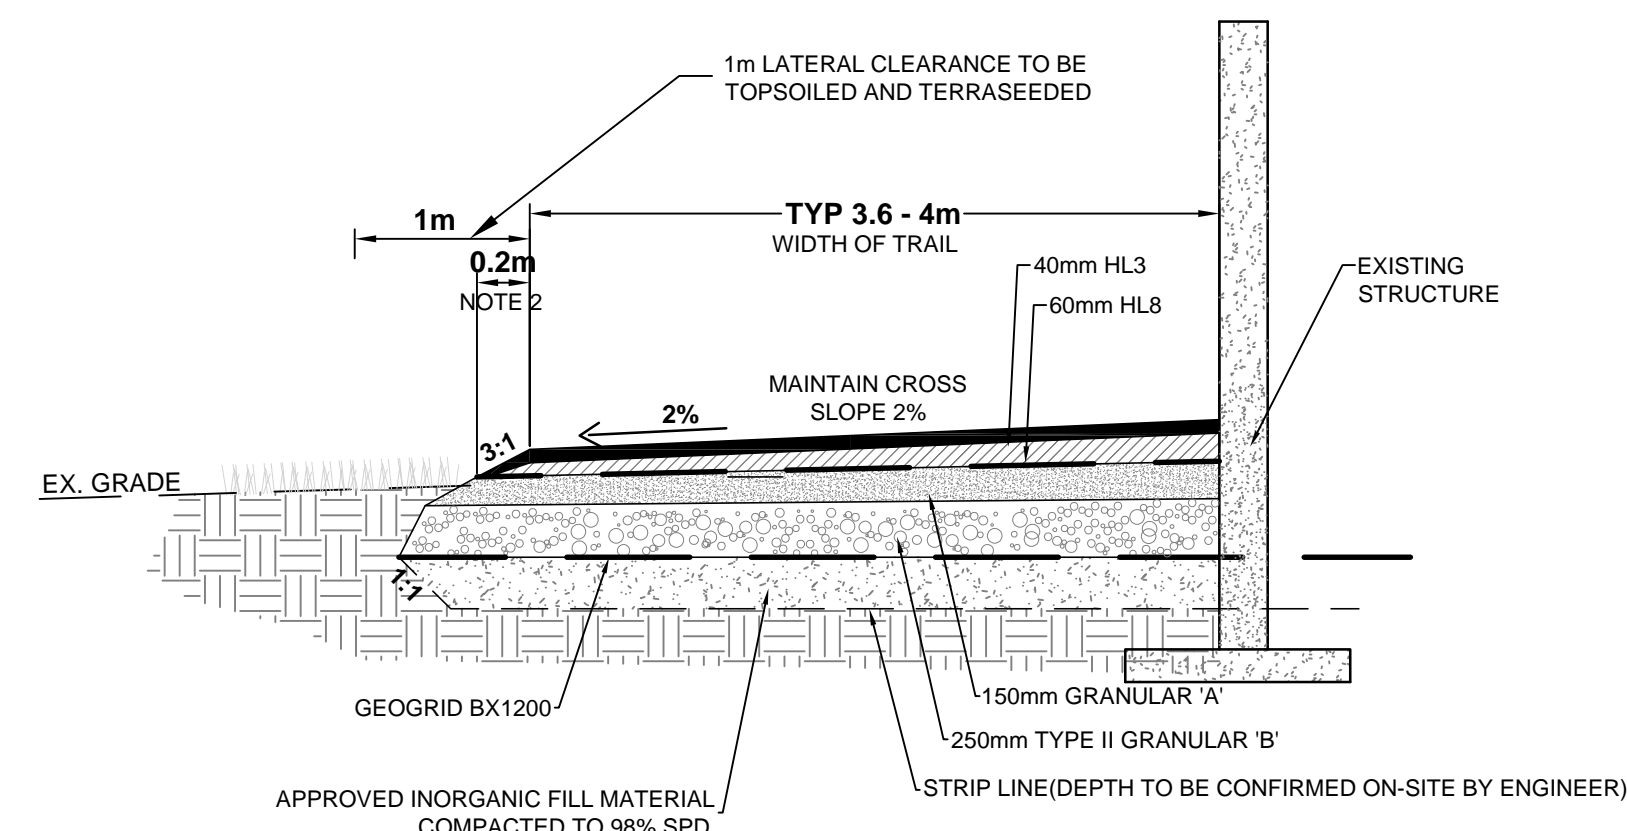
TYPICAL CROSS SECTION (3.6-4m WIDE)
